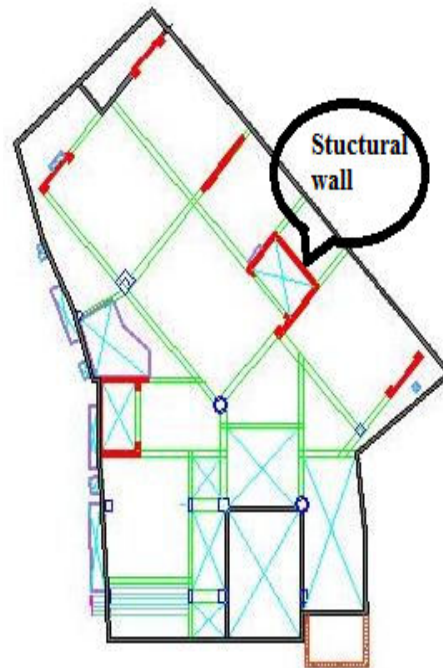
A typical floor plan of a RCC frame with structural building.
